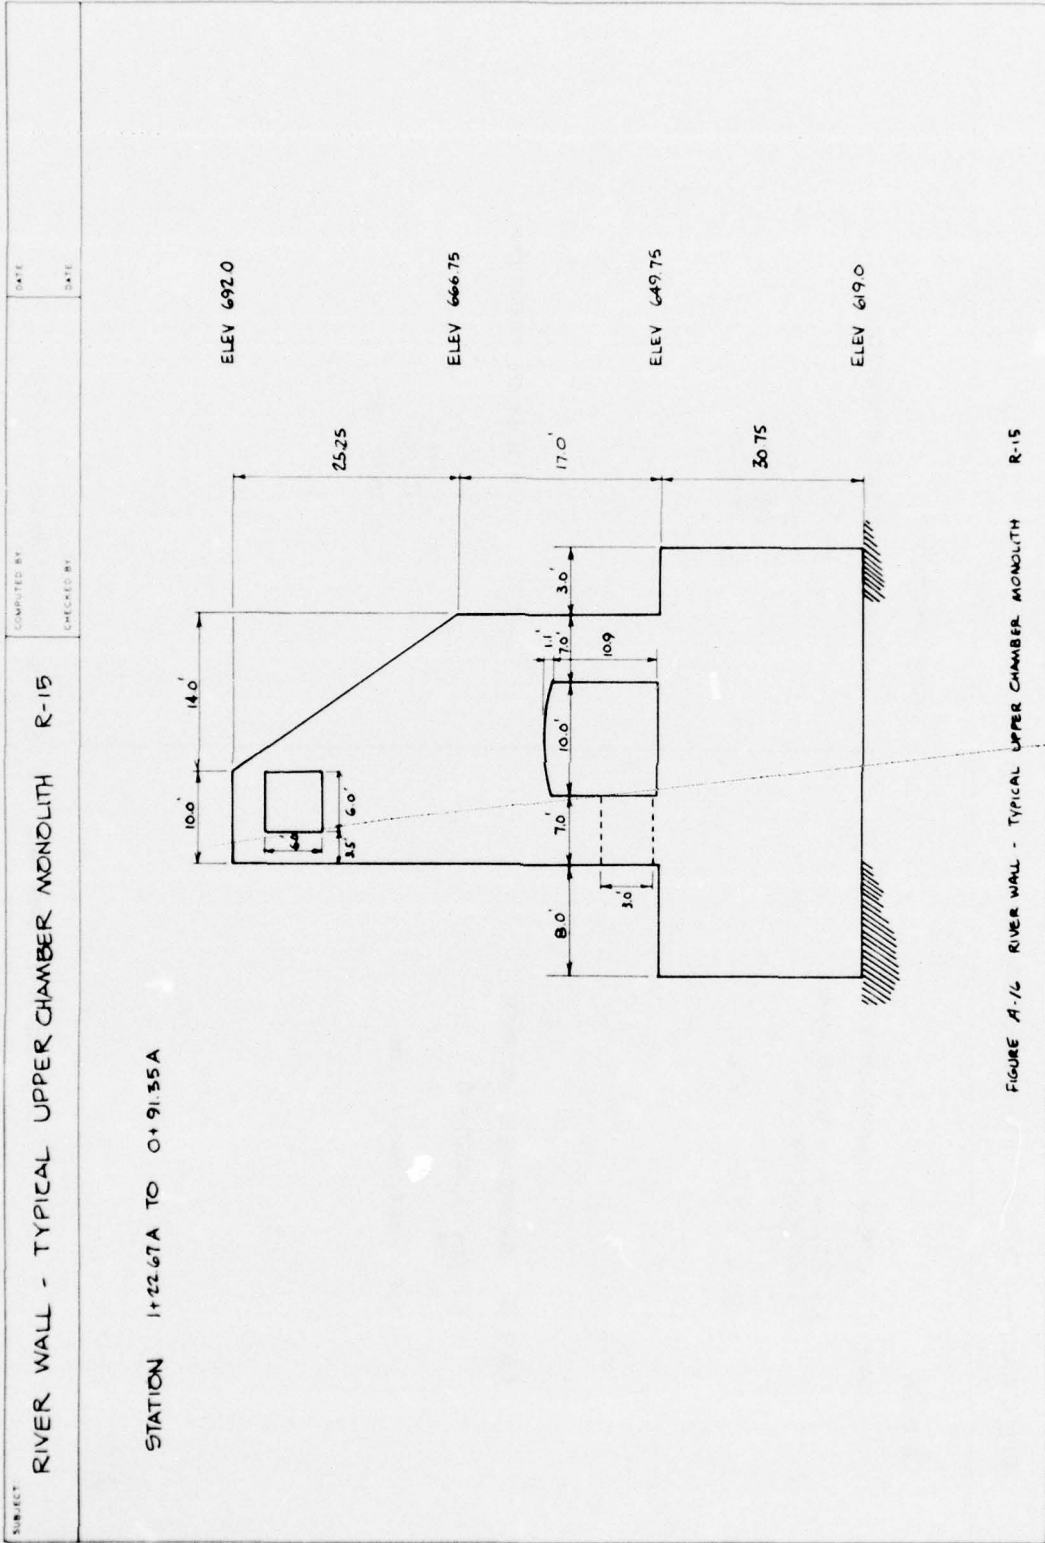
RIVER WALL - TYPICAL UPPER CHAMBER MONOLITH R-15
